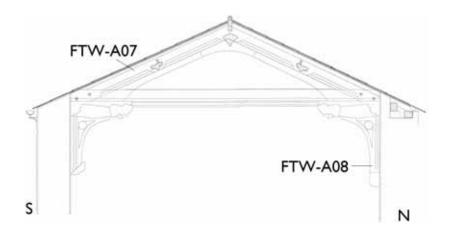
East elevation of truss 4 (based on truss 2), showing the location of samples FTW-A07 and FTW-A08 (Freeland Rees Roberts Architects)
